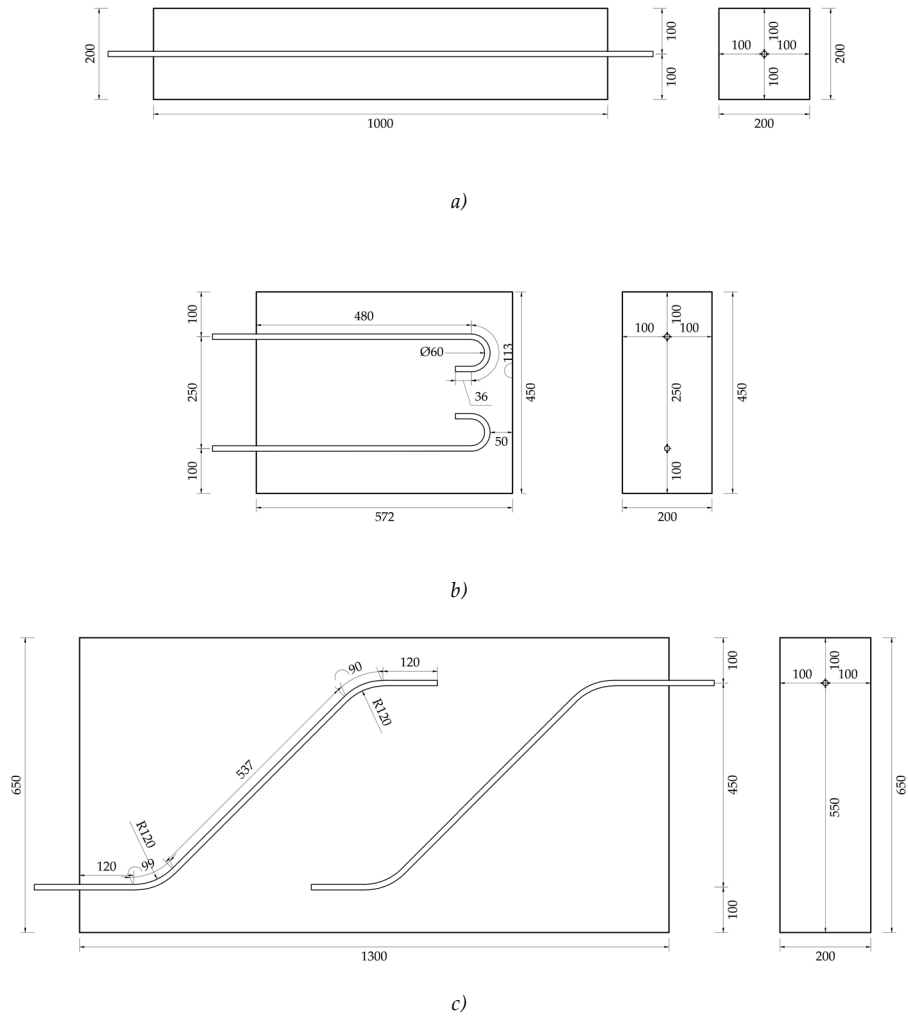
Geometry of the reference specimens: Straight length bar SL-type a), Hook-end anchorage for the H- and HS-sample types and Bent rebars c). Dimensions refer to bar centreline.
